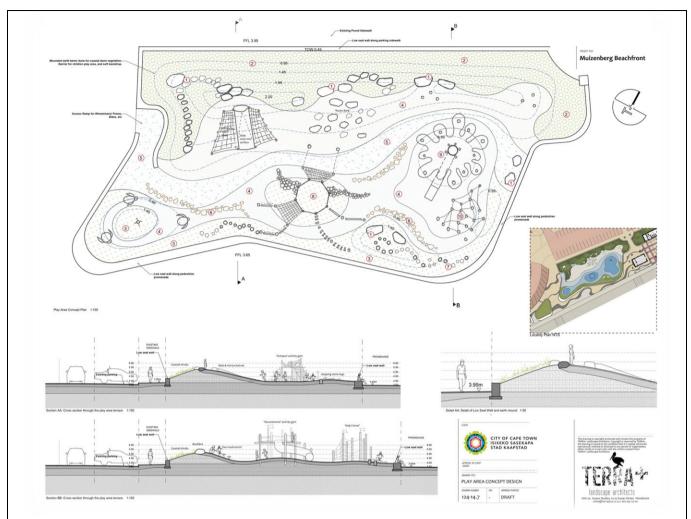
Proposed layout of the new playground. Refer to Appendix B1.5 for a larger-scale drawing.
